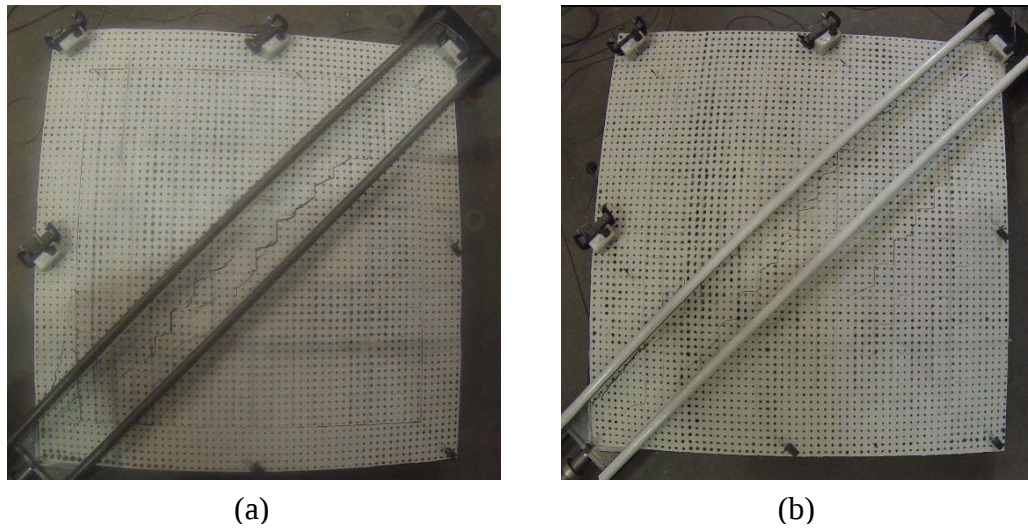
Damage observed at load associated with displacement capacity in (a) the masonry infill wall and (b) the confined masonry wall
